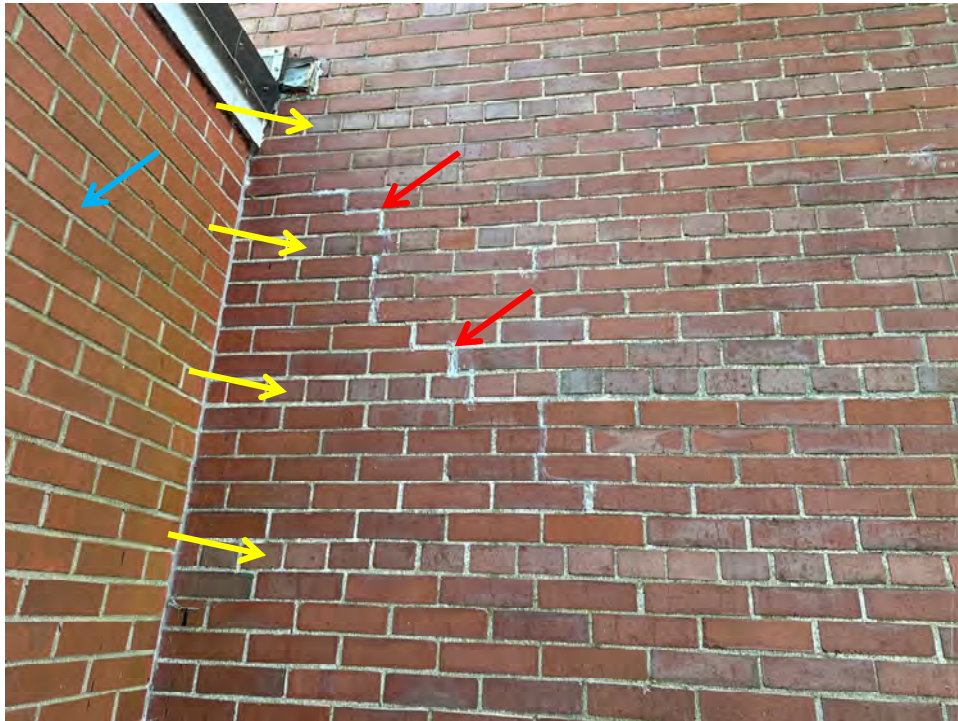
Typical brick masonry bond pattern. Yellow arrows at header courses. Red arrow at step cracking with touch up sealant repair attempt. Blue arrow on west wall of Electric Light Shop
